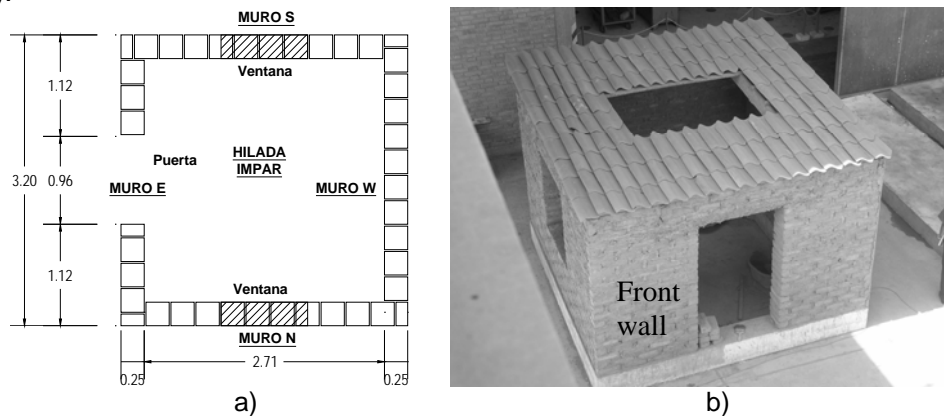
Adobe module tested at the PUCP, a) dimensions on a plan view, b) 3D view of the adobe module.
